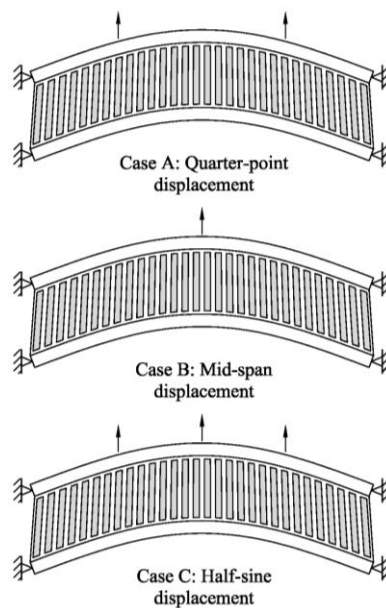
Lateral loading tests conducted in a twin-girder system (adapted from Egilmez (2009))
